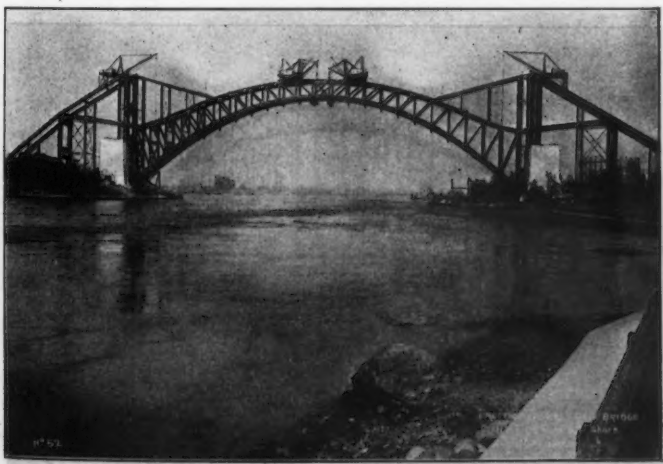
HELL GATE BRIDGE: ERECTION STAGE, OCTOBER 4TH, 1915.
